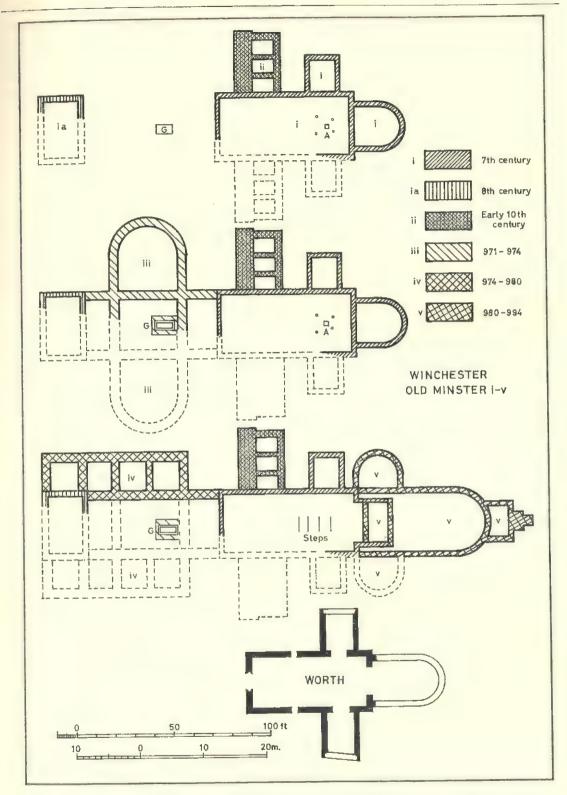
WELL DEFINED PLANS (9). WINCHESTER AND WORTH
